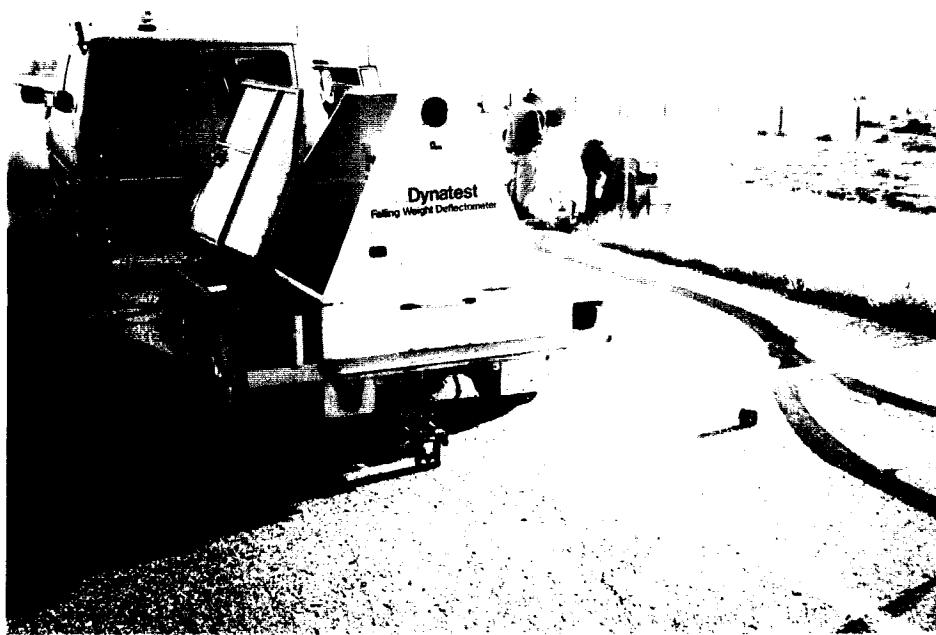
FWD Testing Instrumentation Area Prior to Installation
